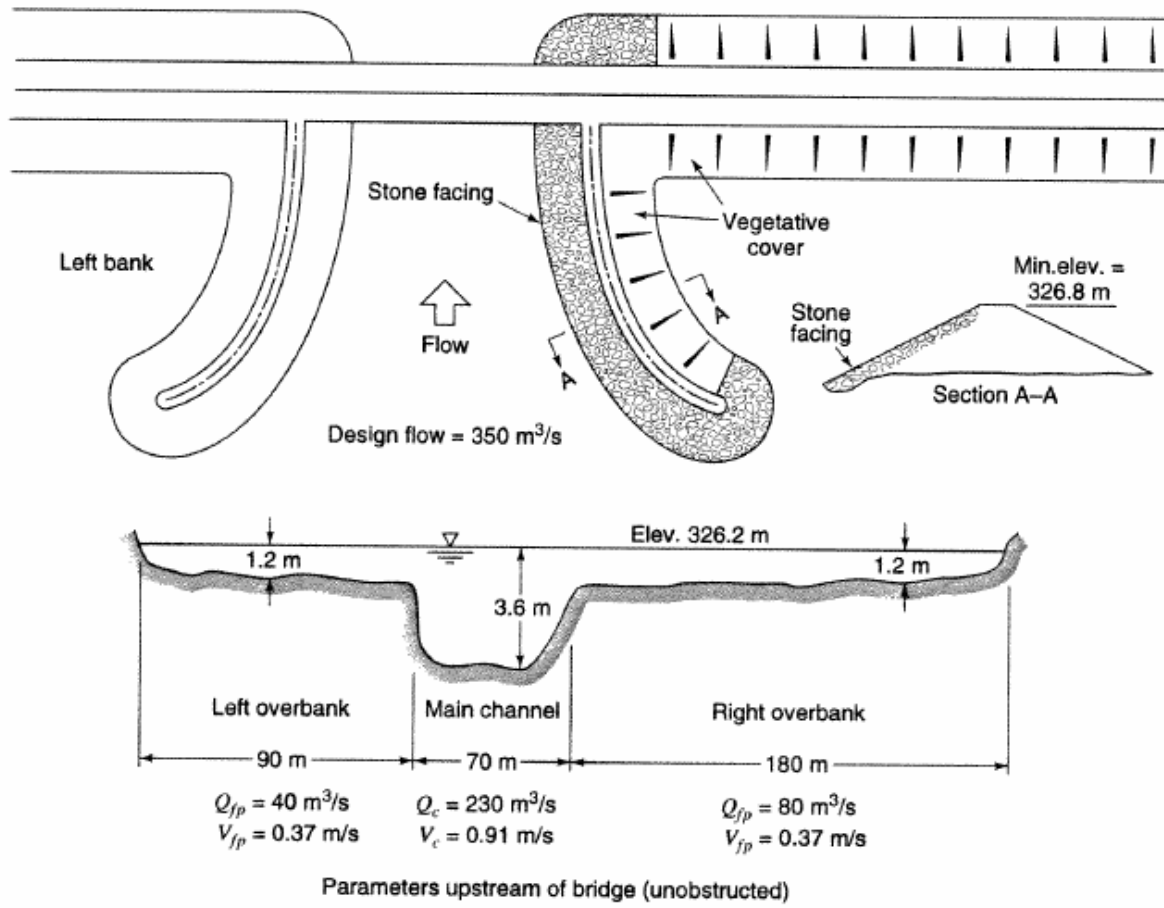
Example guide bank design (from Lagasse et al., 2001a).
